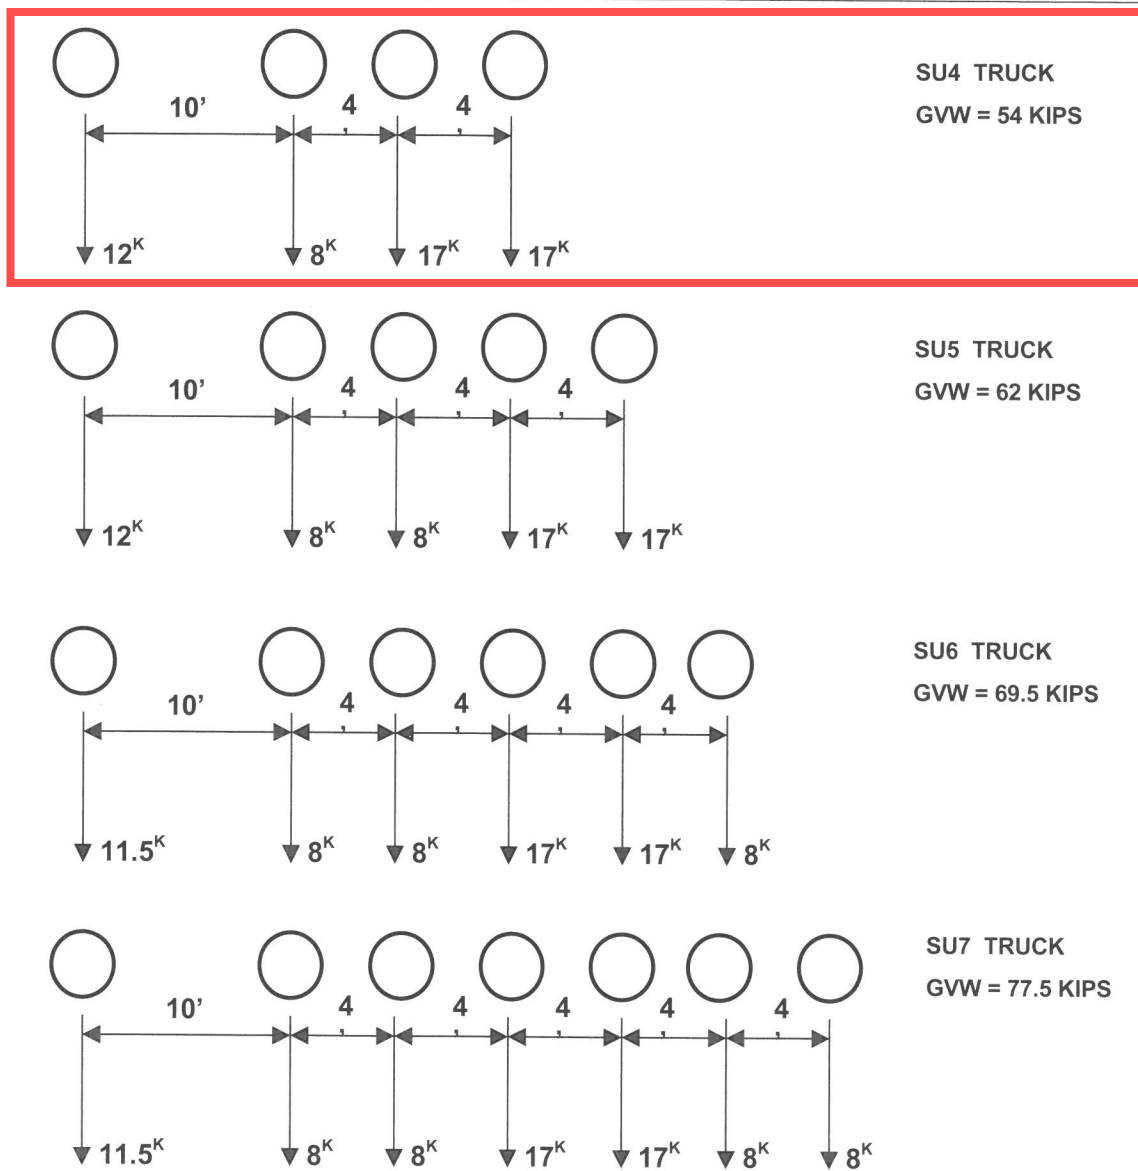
B.7.2-2—Bridge Posting Loads for Single Unit Trucks that Meet Formula B
